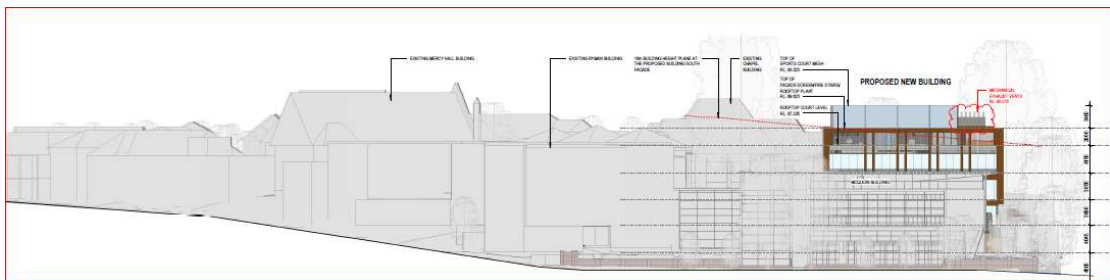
View across the site with the areas of the proposed external changes clouded red. There are no significant changes to the scale, bulk or form of the approved school building. (Source: Hayball Architects)
